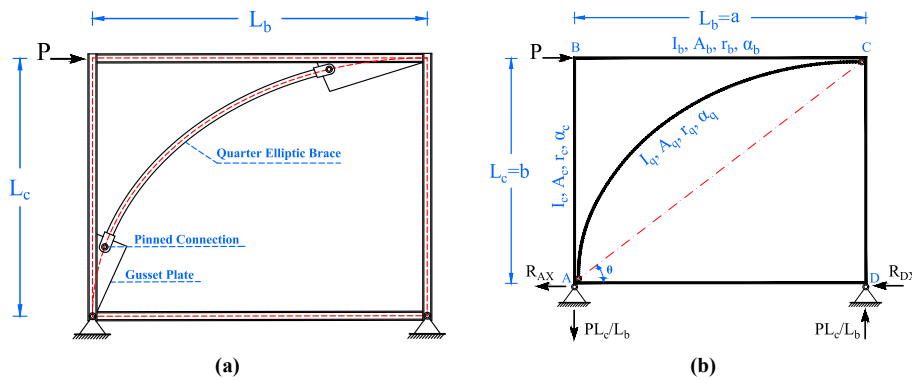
(a) The desired steel moment frame with directly welded rigid connections equipped with quarter-elliptic brace, (b) Side view of QEB-MF systems.
